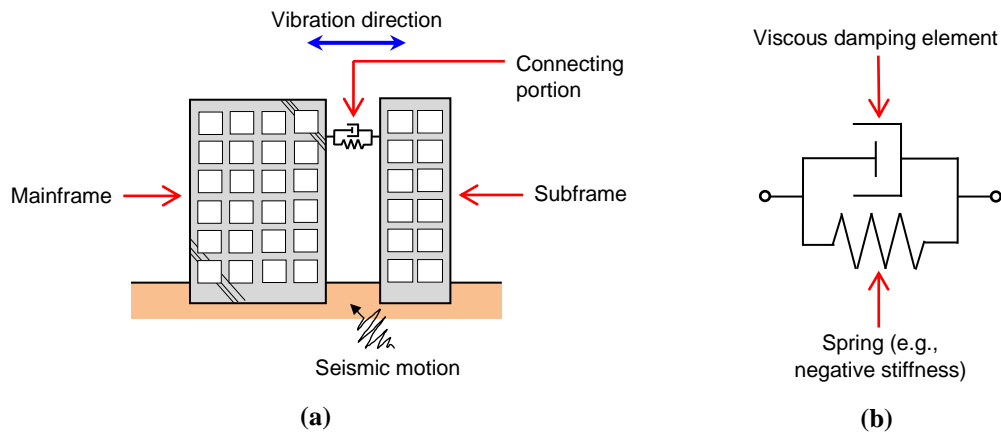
Conceptual diagram of a coupled vibration control (CVC) building structure: (a) elevation view of whole system; and (b) enlarged view of connecting portion consisting of a spring and a viscous damping element
